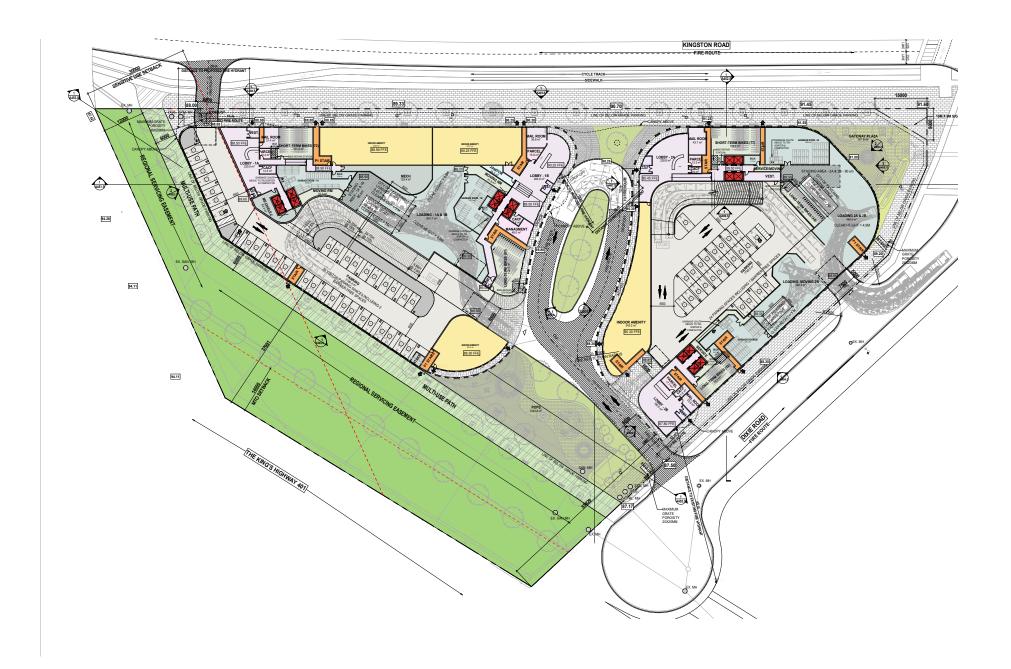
Ground Floor Plan (BDP. QUADRANGLE ARCHITECTS LTD.)
